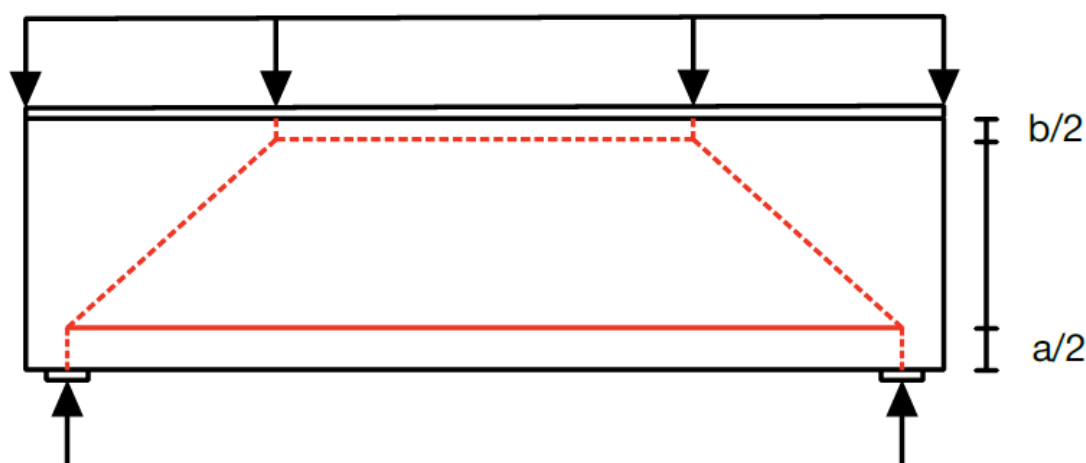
Strut and Tie model for Model 2.2 with 25 MPa prestressed reinforcement
